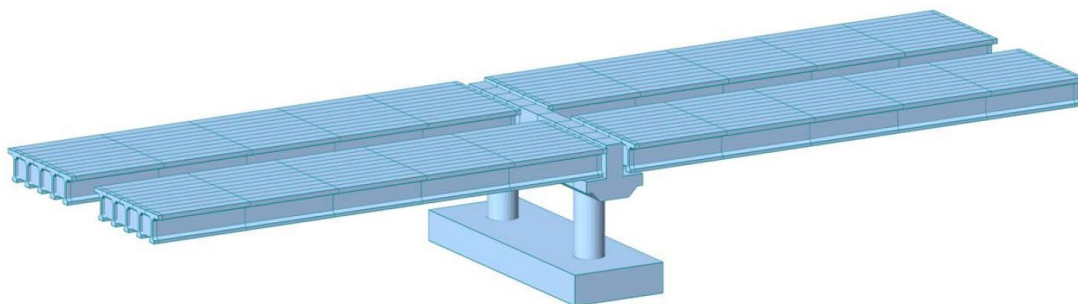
Bridge structure model (girder-pier head-pier-pile cap)
